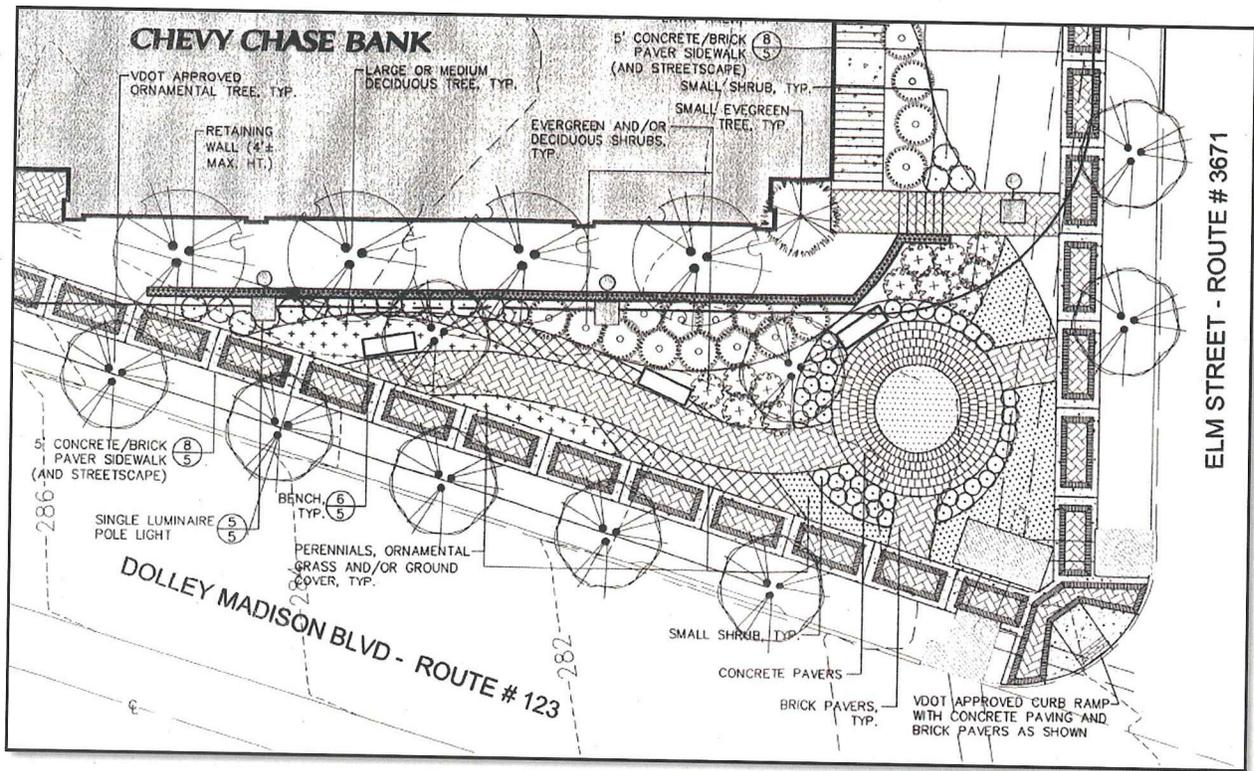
A portion of Sheet 2 of the SE Plat showing the details of the landscaping and pavers for the pocket park at the corner of Dolley Madison Boulevard and Elm Street. (Source - BC Consultants, 2008)
